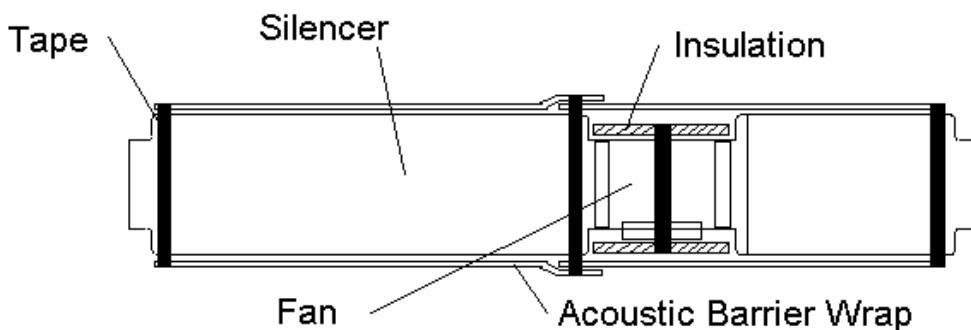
Drawing of a typical WJ-250KIT assembly. (WJ-315KIT would have three pieces of acoustic wrap along the length of the assembly).
